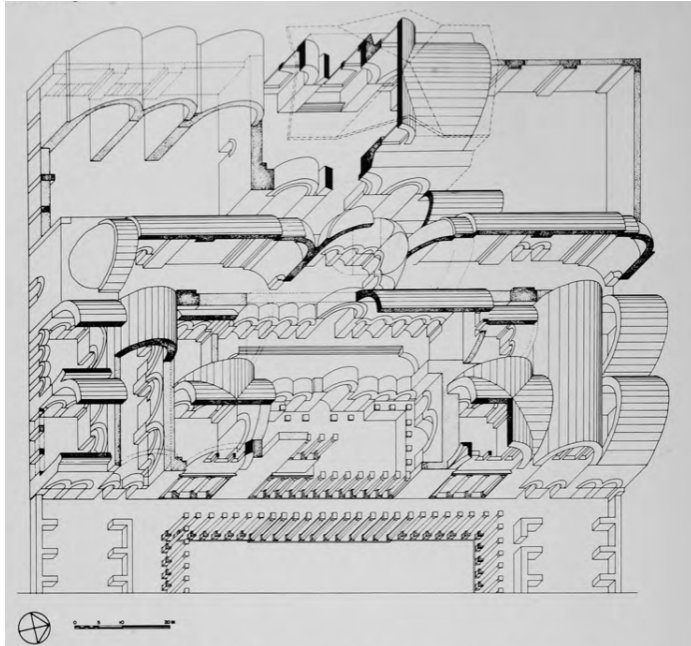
Restored axonometric study of the structural system of the Bath Block. Piers, arches, and vaulting.
